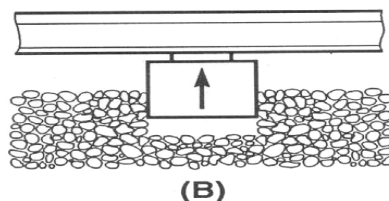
Tamping Machine [Plasser and Theurer, 2013]
